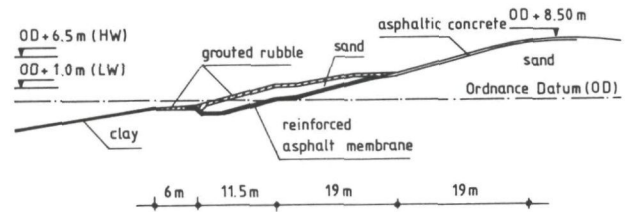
Waterproofing and protective revetment with asphalt grouted Reno mattresses.
